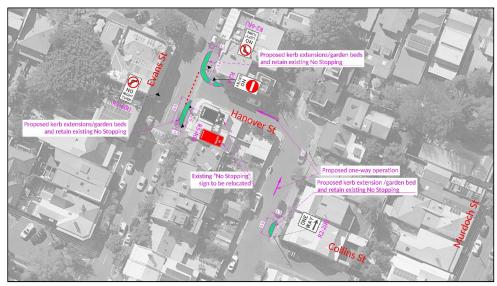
Evans Street / Hanover Street / Collins Street T-intersections proposal.
